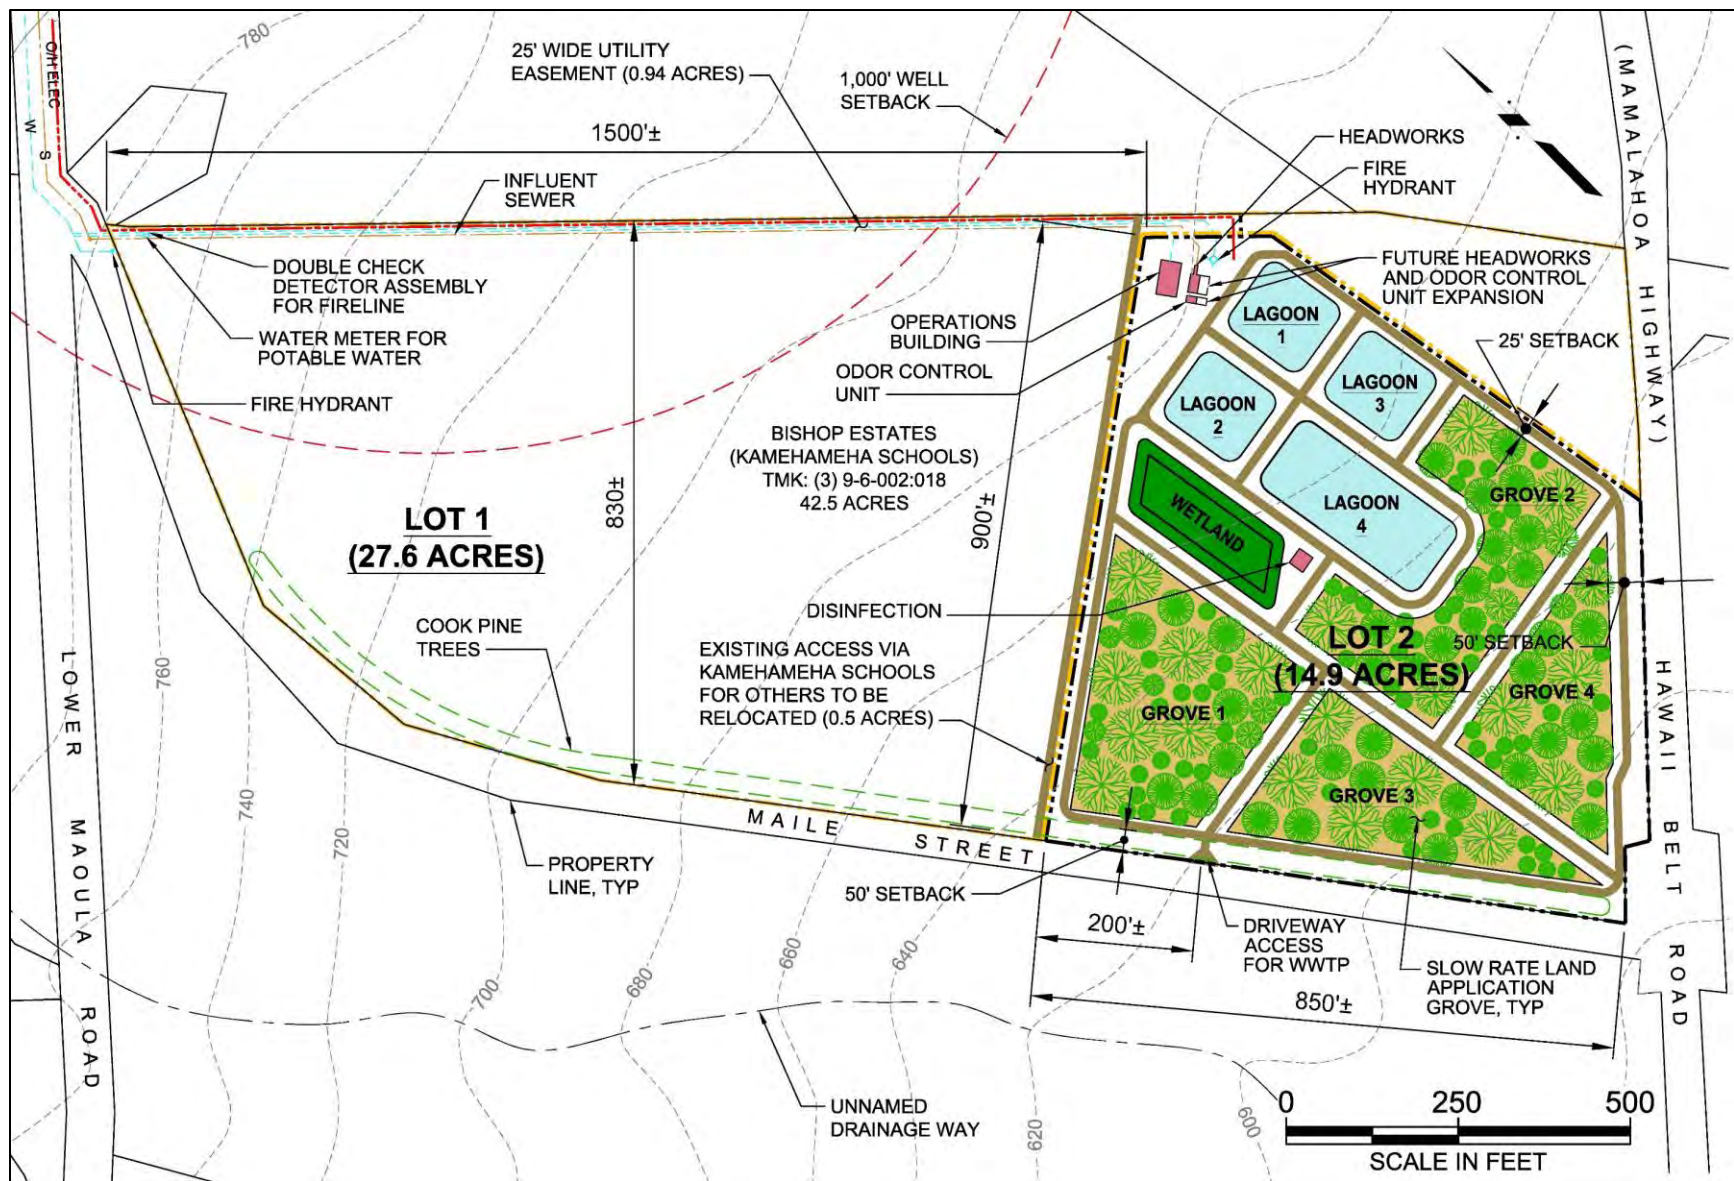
Preliminary Site Plan for New Wastewater Treatment and Disposal Facility at Site 7 (Preferred Alternative)
